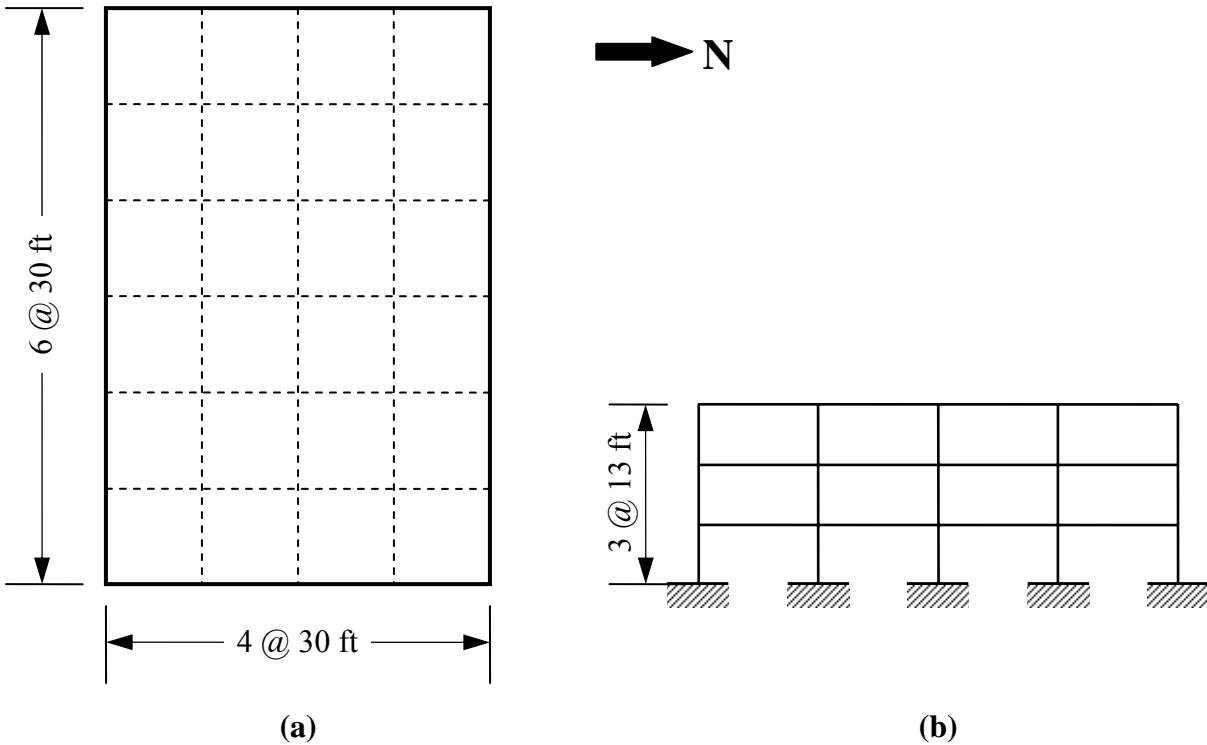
Prototype Structure: (a) Plan View; (b) N-S Elevation View (FEMA 355-C)
